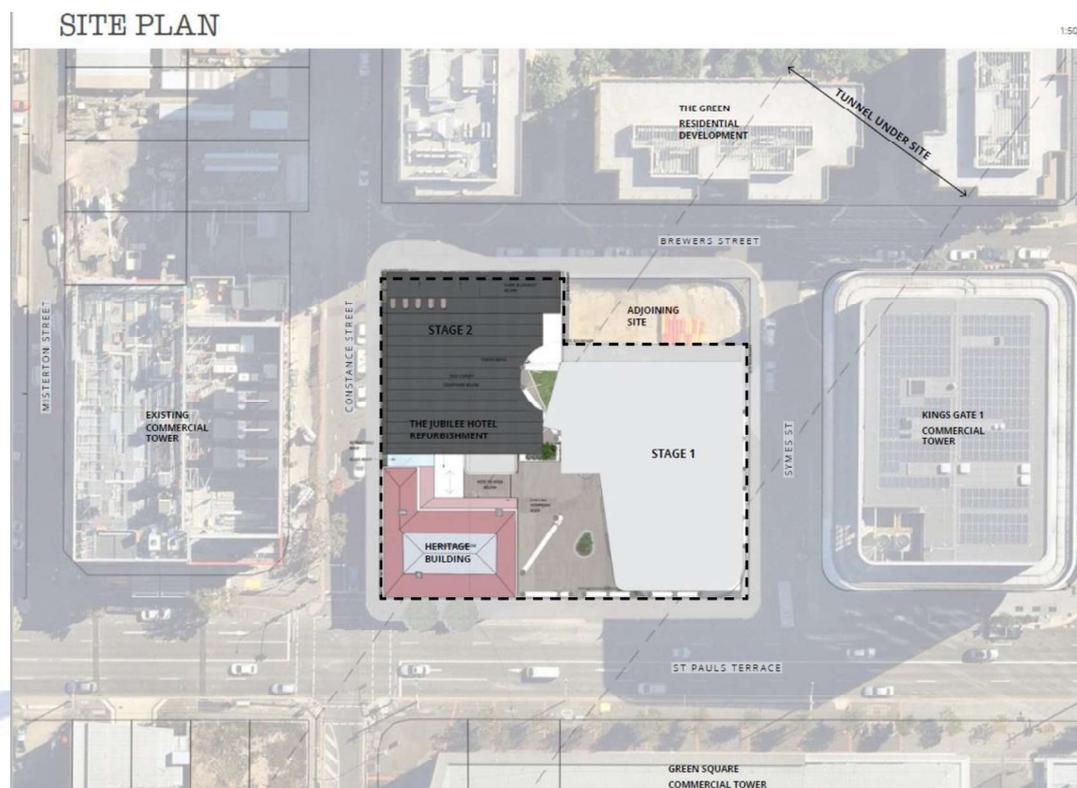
Site Context (Blight Rayner Site Plan 30.09.2020)
